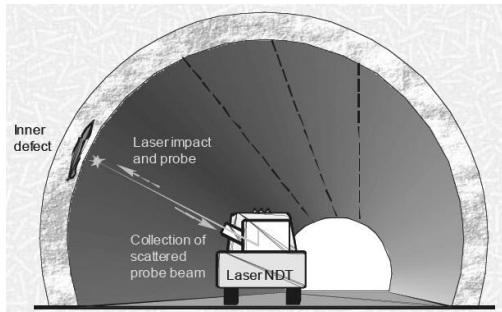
Schematic of the hammer-like laser remote inspection system [49]
